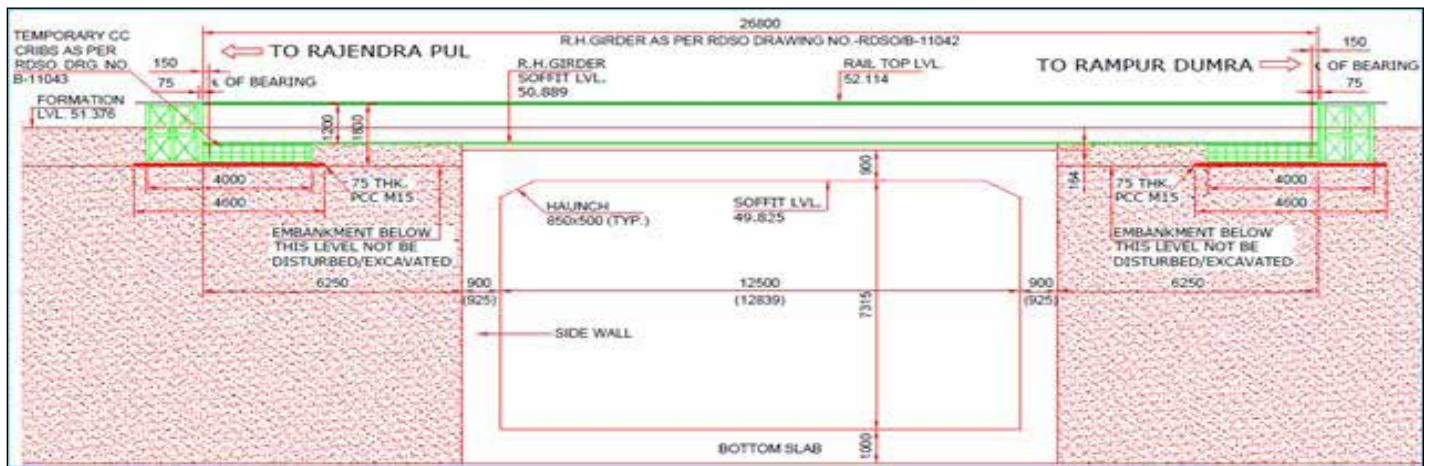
Temporary Deck RH Girder Arrangement to Isolate Railway Traffic from Box Top
